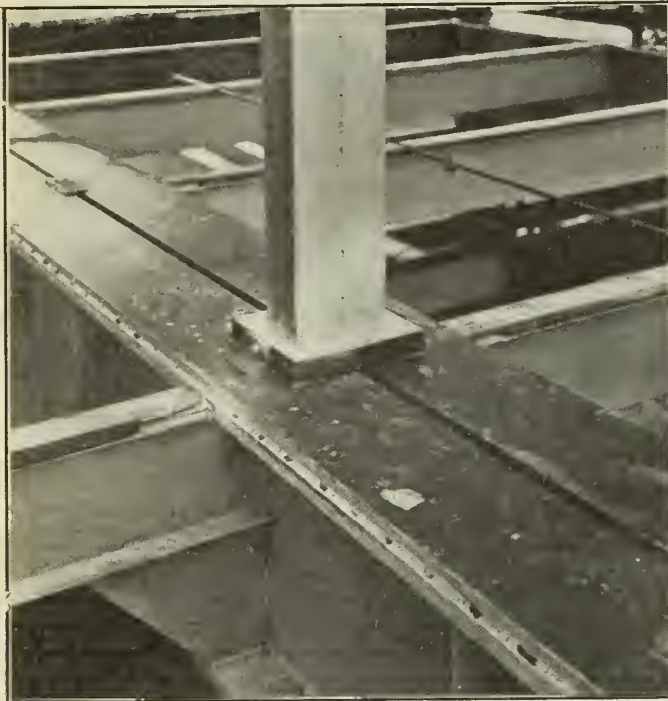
Welded Plate Girders of the Sharon Building.
